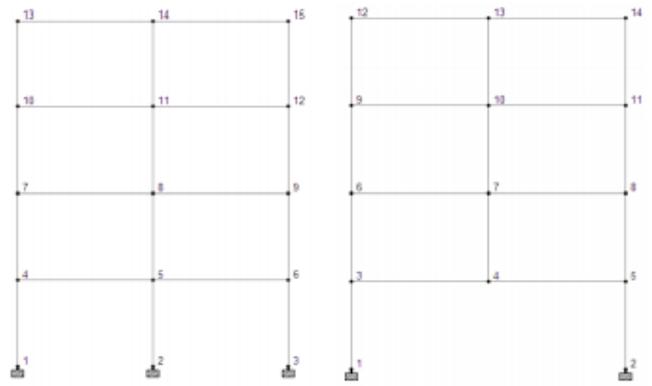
2D Frame with usual columns and 2D Frame with Floating column
